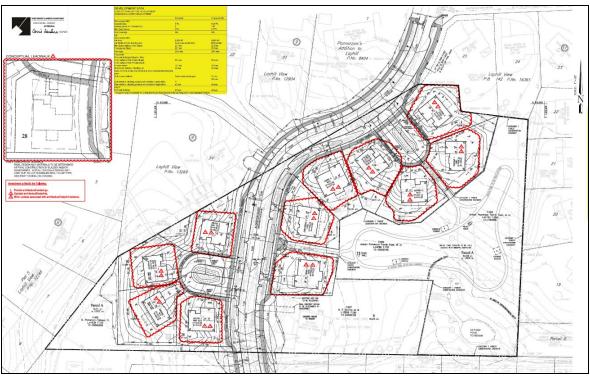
Proposed Redline Changes to Building Footprints and Lead Walks
